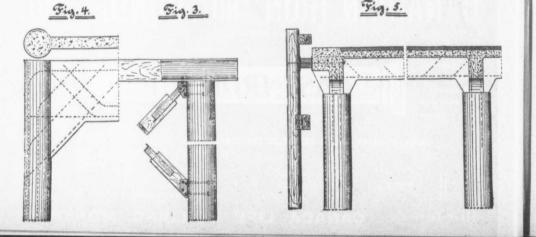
shows these casings in the construction of trestle bents or piers, with cap of wood or steel, anchored to the interior concrete, also with wood or steel bracing, attached in an approved substantial manner.
